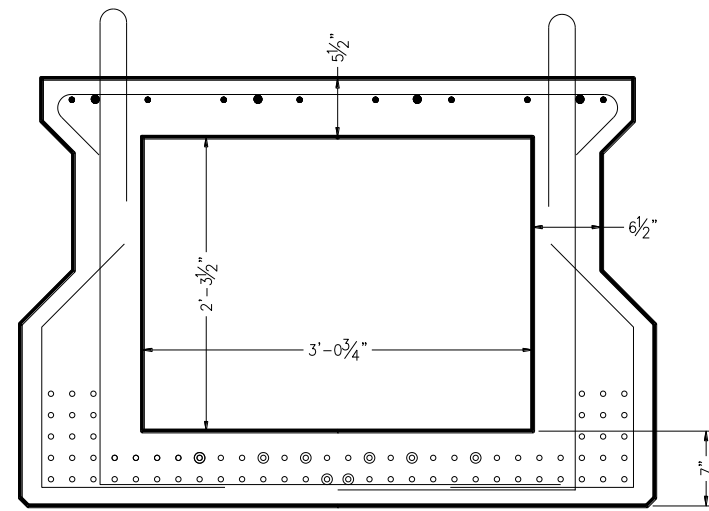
New Reinforcement Bars Details. Beam 5B40-4
